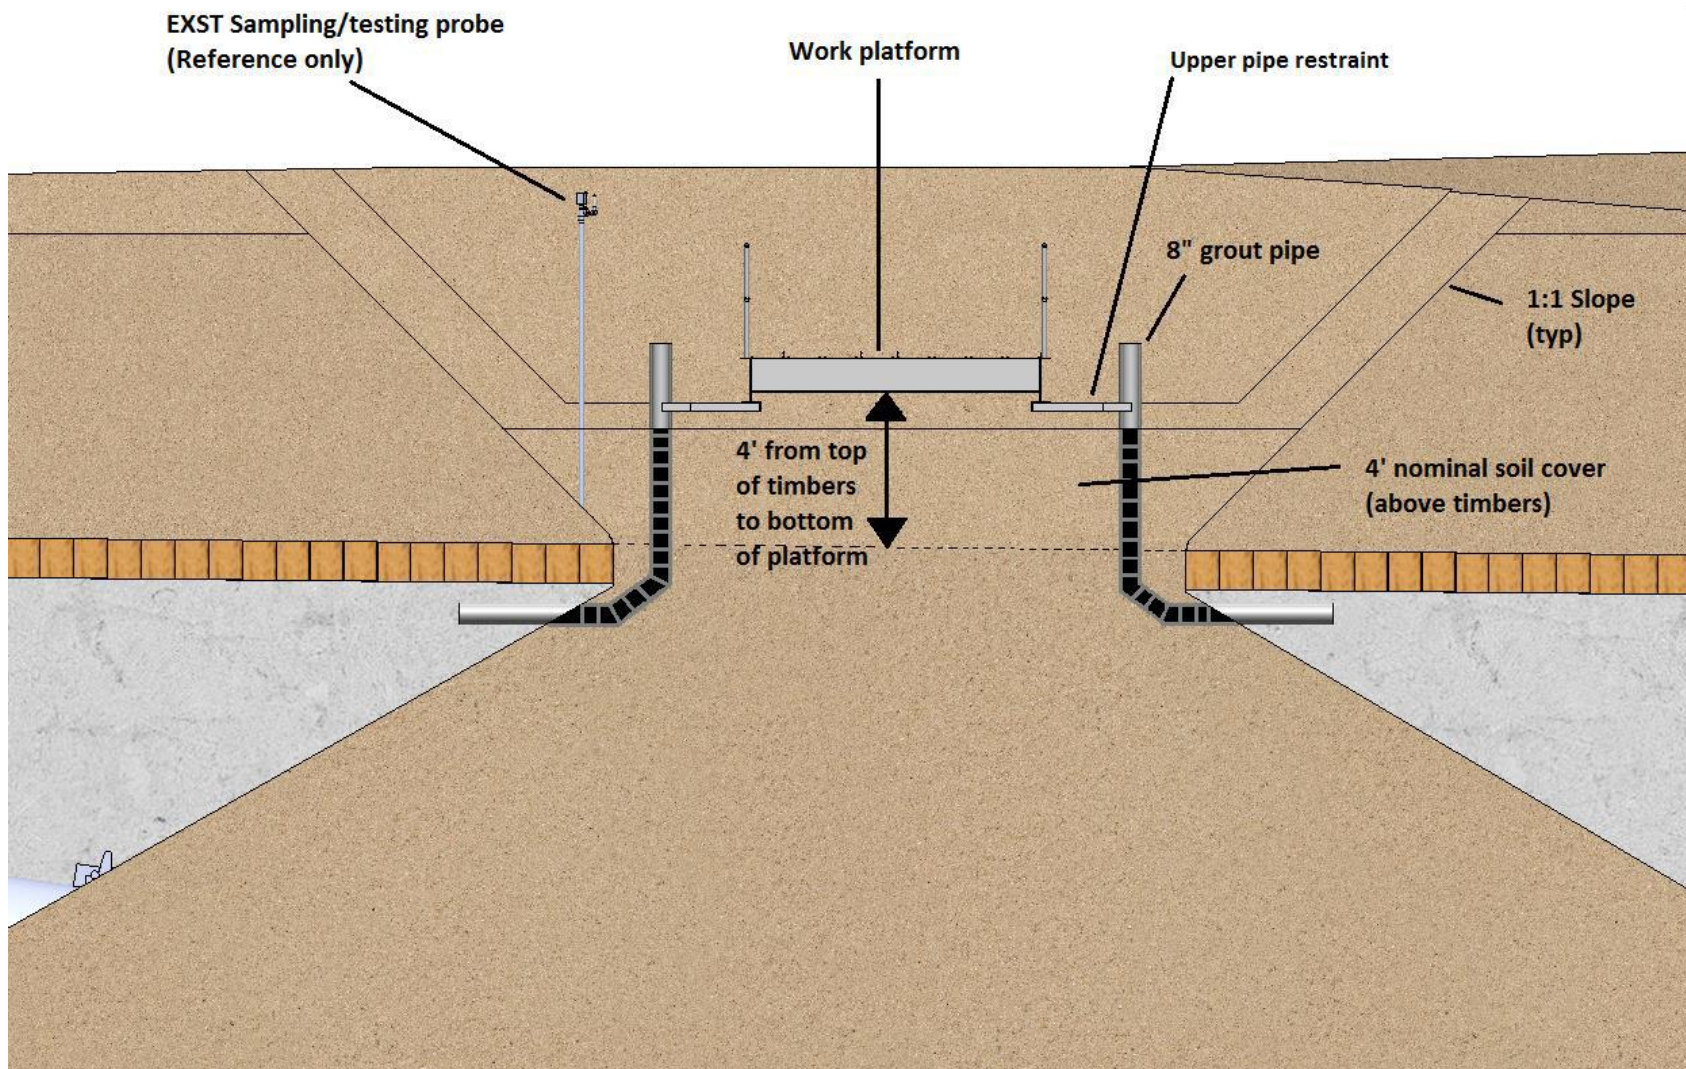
West Elevation of Tunnel Number 1 with Equipment Placement
